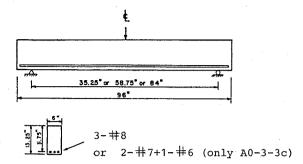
Test specimens (1 in. = 25.4 mm).
